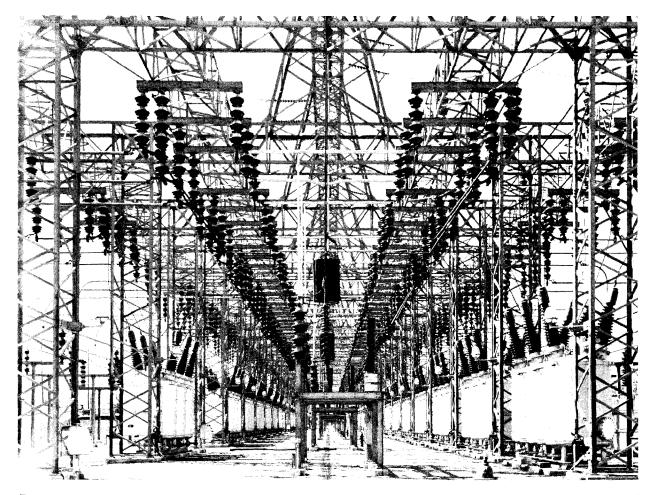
161-kv switchyard is arranged in 25 bays and contains 33 oil circuit breakers, 90 disconnecting switches, and 24 potential transformers.
